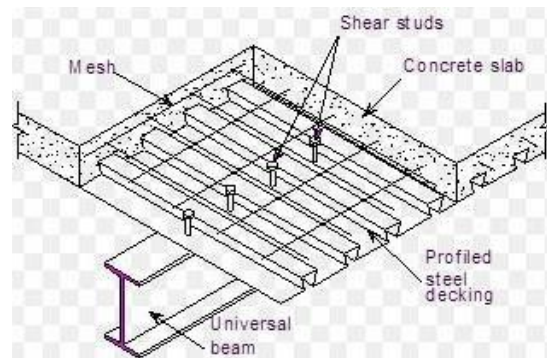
Presentation of composite slabs (theconstructor.org/practical-guide/concrete-)
